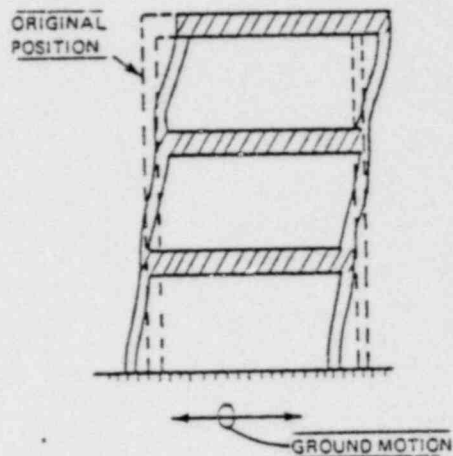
MOVEMENT OF FLEXIBLE BUILDING
